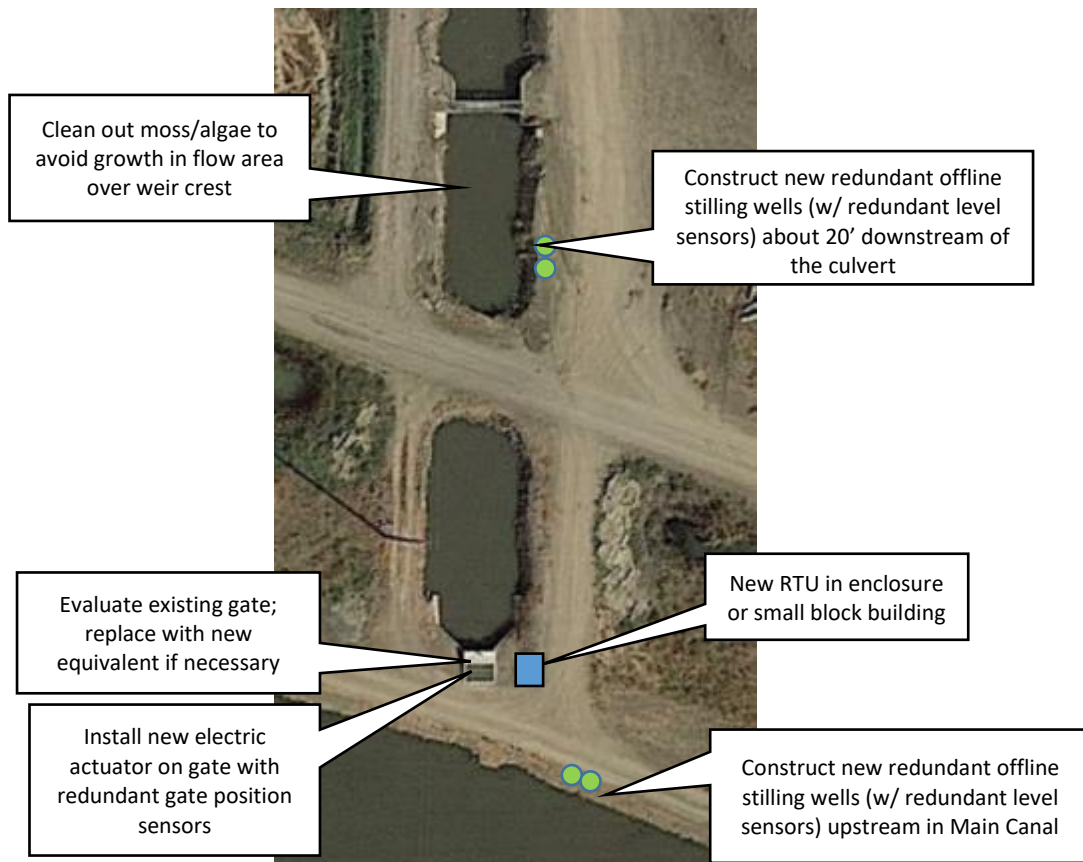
Recommended improvements at Laguna Canal headworks, plan view
